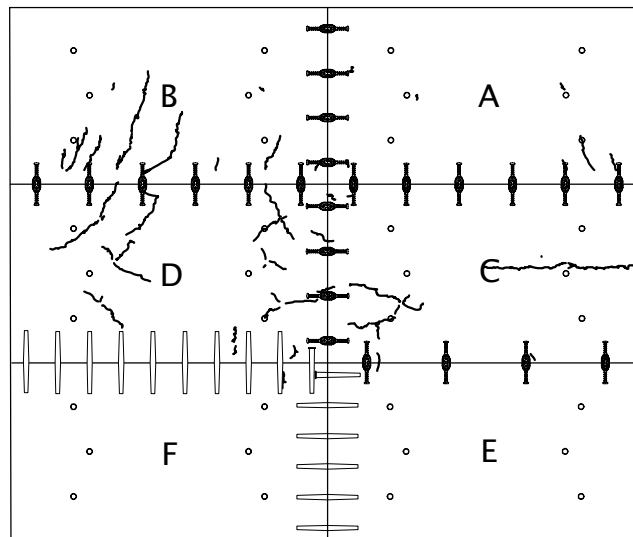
Cracks in PRC slab after repeated loading test.
